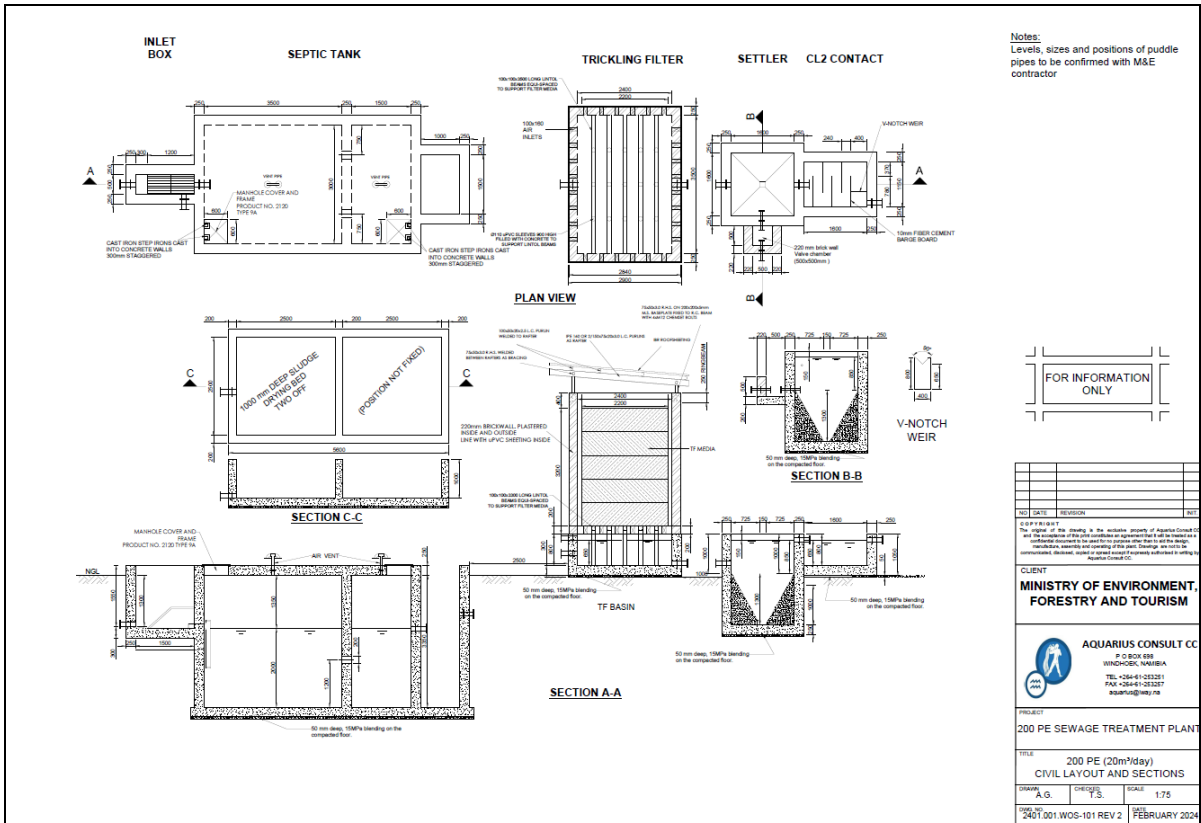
Sewage Treatment Plant layout plan (Aquarius Consult CC)
